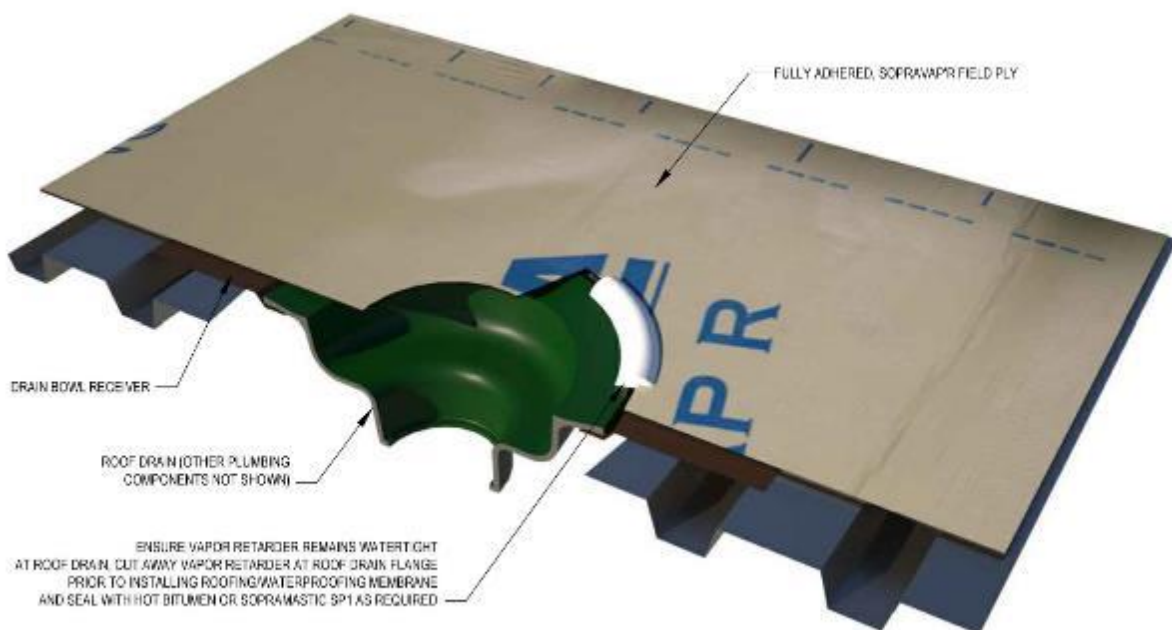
Fully Adhered, Self-Adhesive SOPRAVAP'R at Roof Drain On Steel Deck
